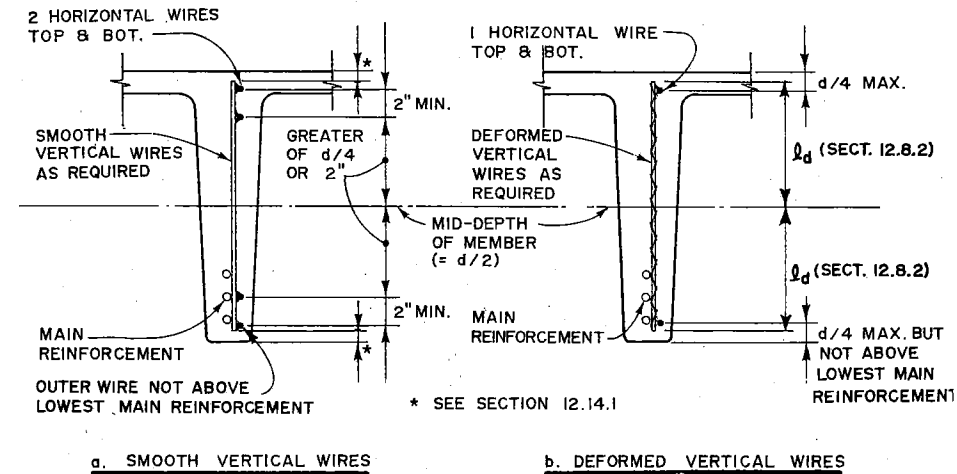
Anchorage of single leg welded wire fabric shear reinforcement.
